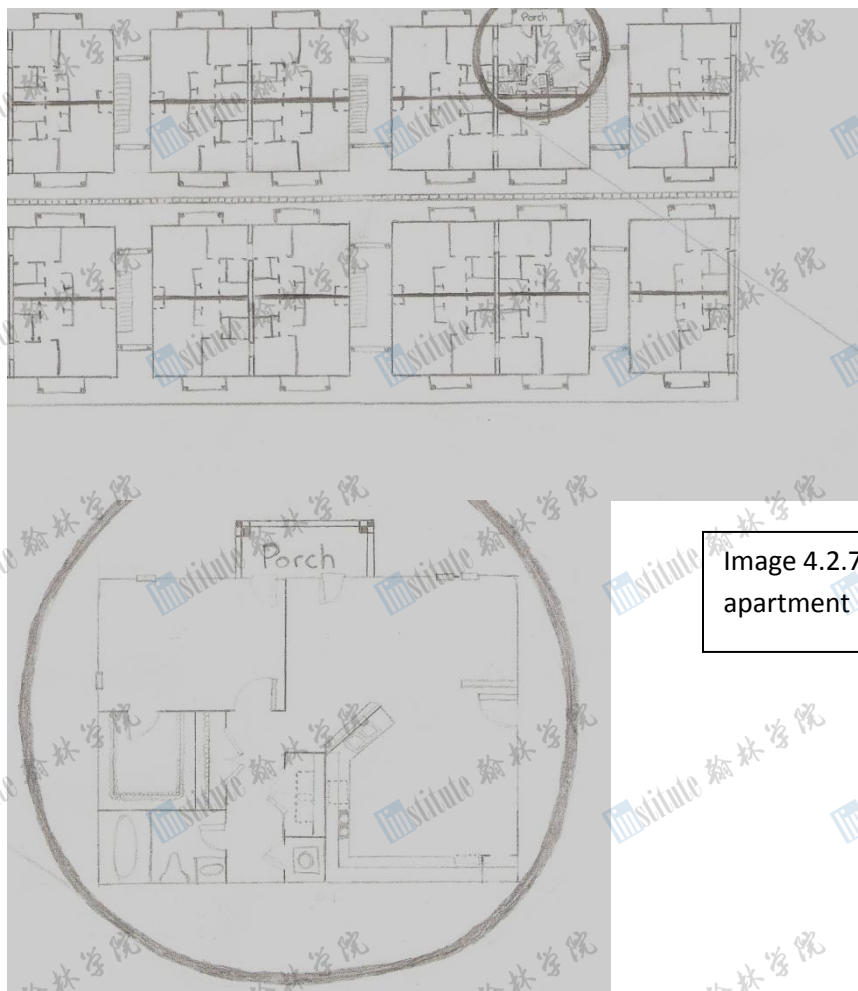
The Apartment Building. One apartment in the building is represented below.
